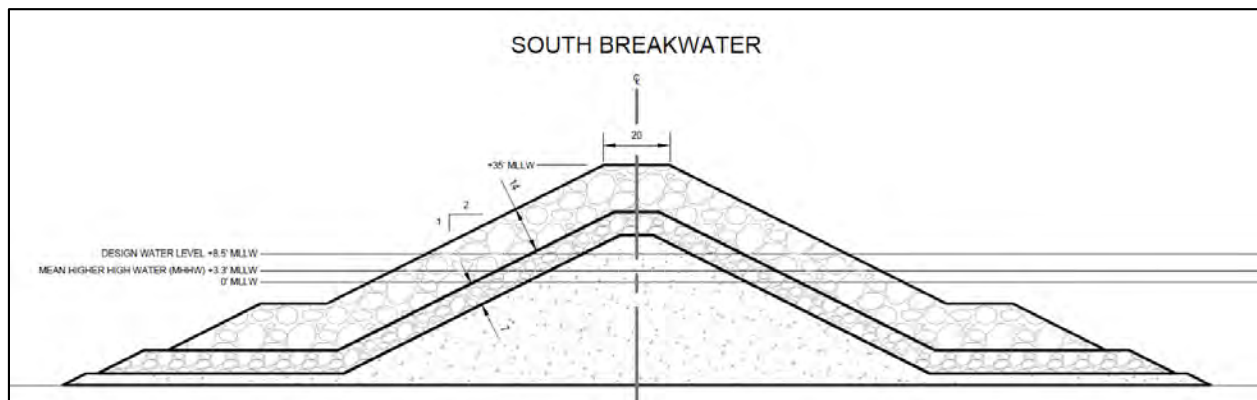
Typical Breakwater Cross Section for Zapadni Bay Alternatives.
